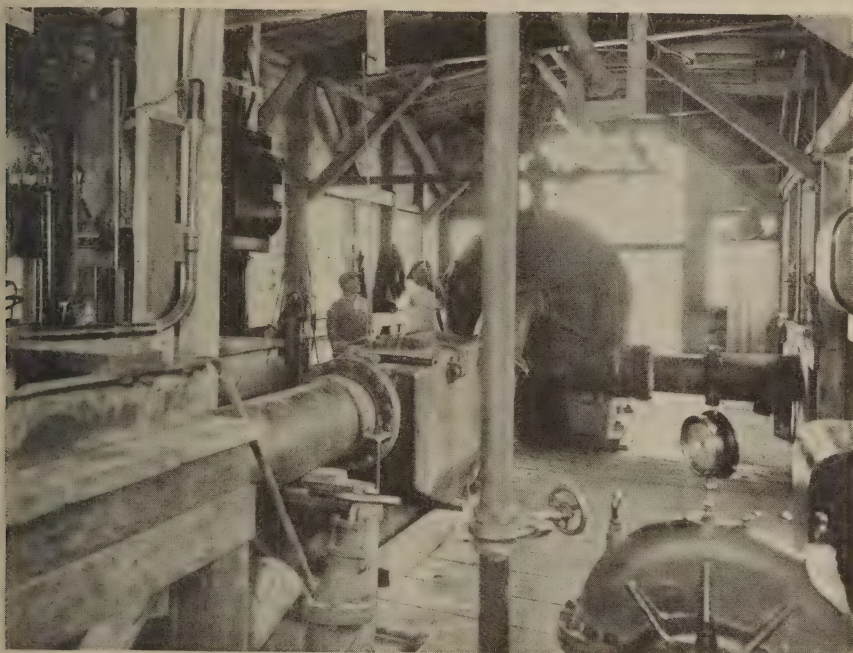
Interior of dredge looking aft, showing stone box in center and 6-inch pressure pump in lower right hand corner.
